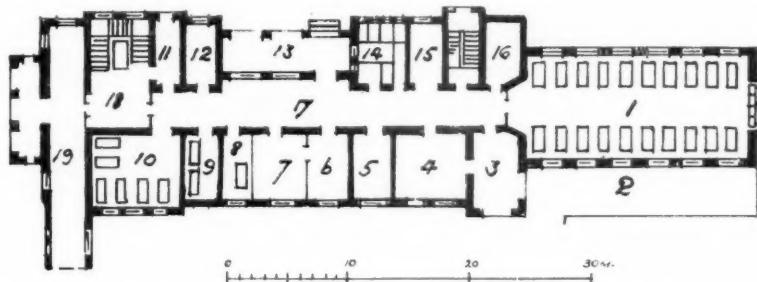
GROUND FLOOR PLAN OF SURGICAL PAVILION, THE LINDENBURG HOSPITAL, COLOGNE.
